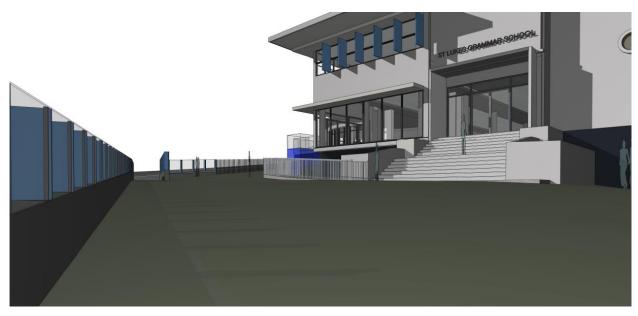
3D image render showing the proposed acoustic boundary wall and accessibility platform lift directly north of the main entry via the Pittwater frontage (western elevation) (Source: TZG Architects, 19.09.2019).
